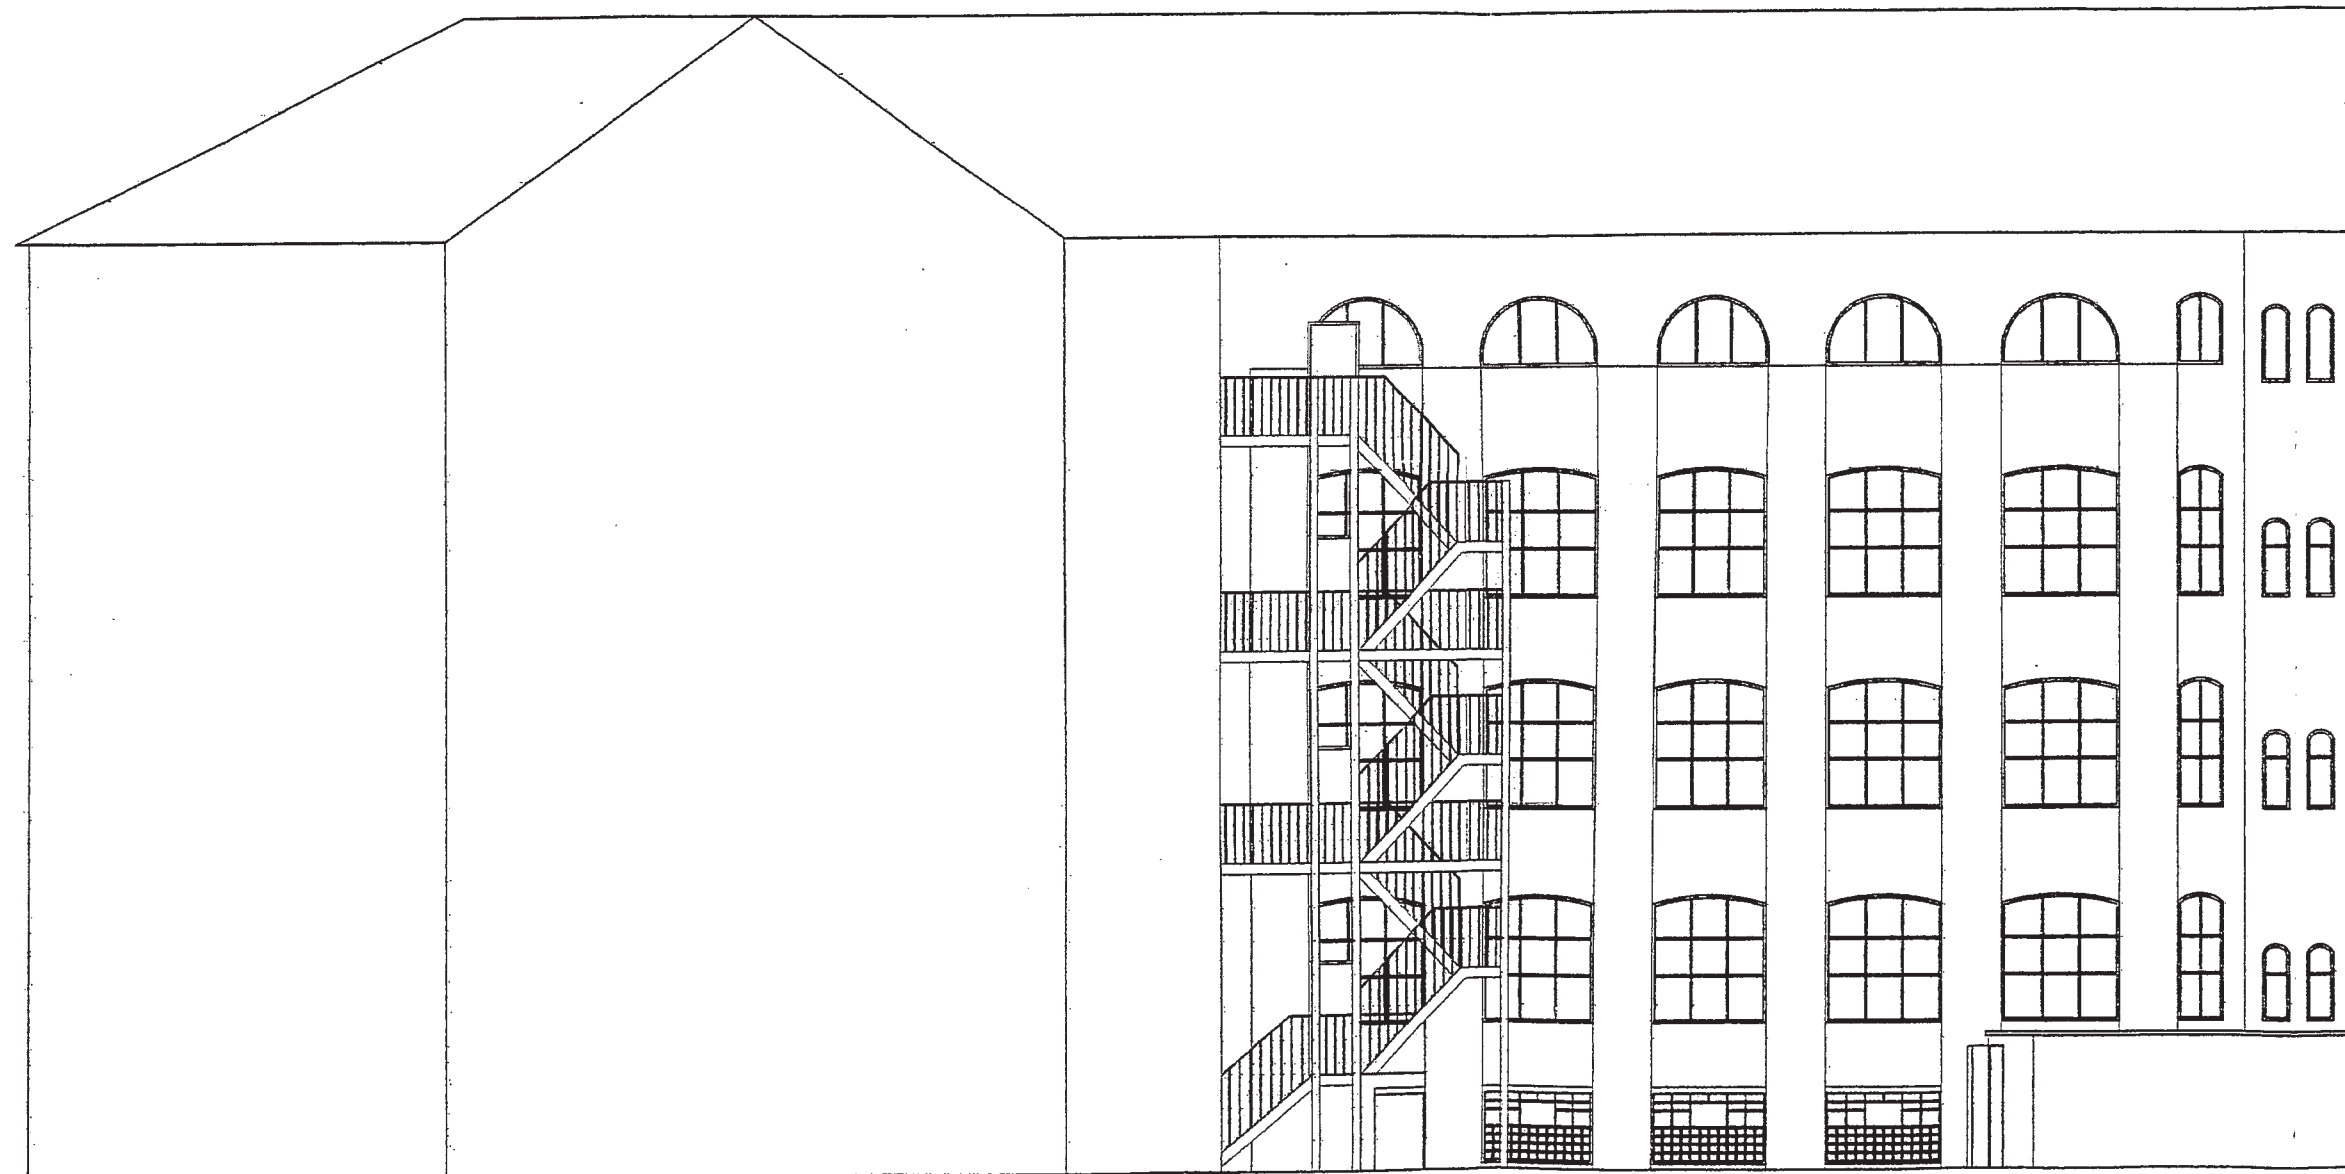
Elevation Drawing A (as supplied by NCHA Architects. Scale 1:200).
